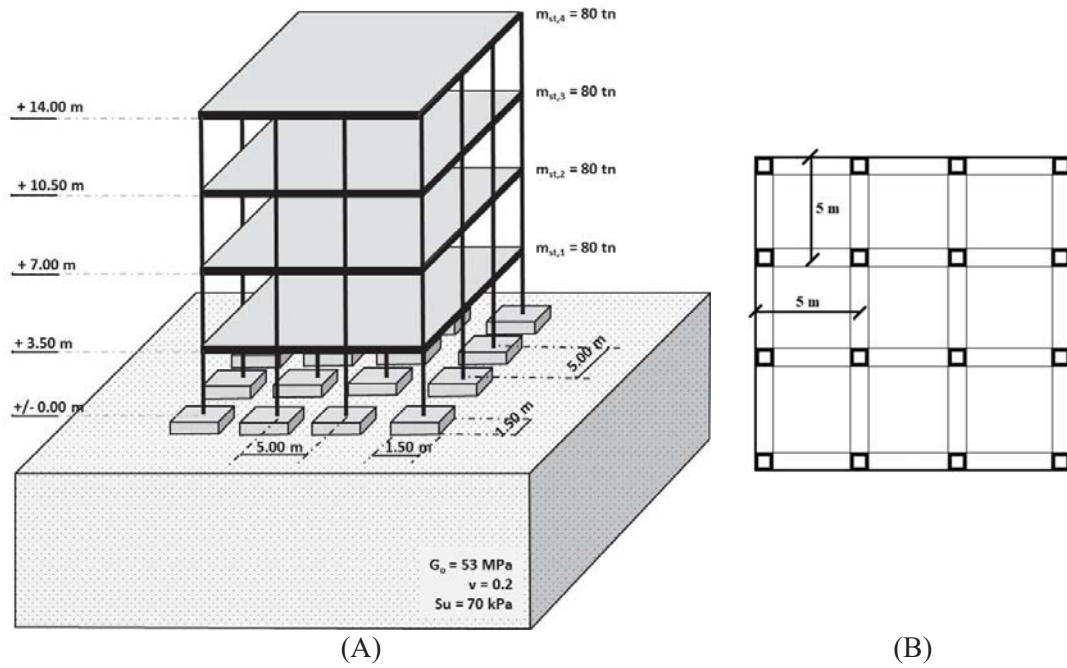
(A) Typical 4-storey residential building investigated as a case study, (B) Plan view of a typical floor of the building considered in this case study.
